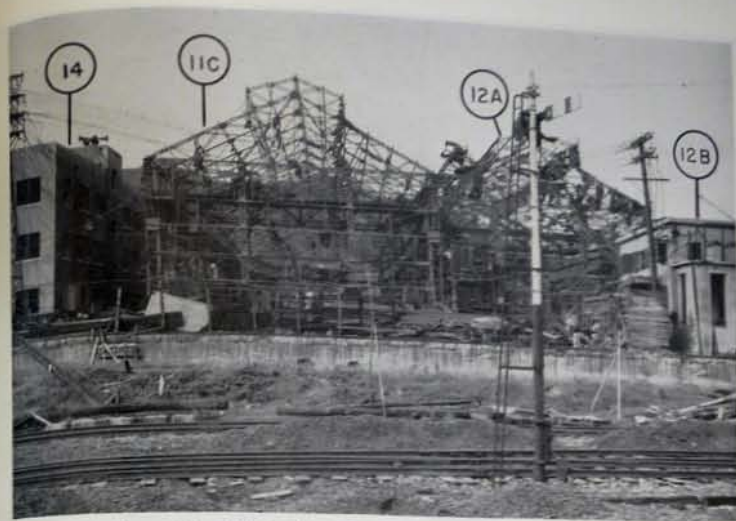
3,400 feet from GZ. Group 26, Building 11C. Looking west.
